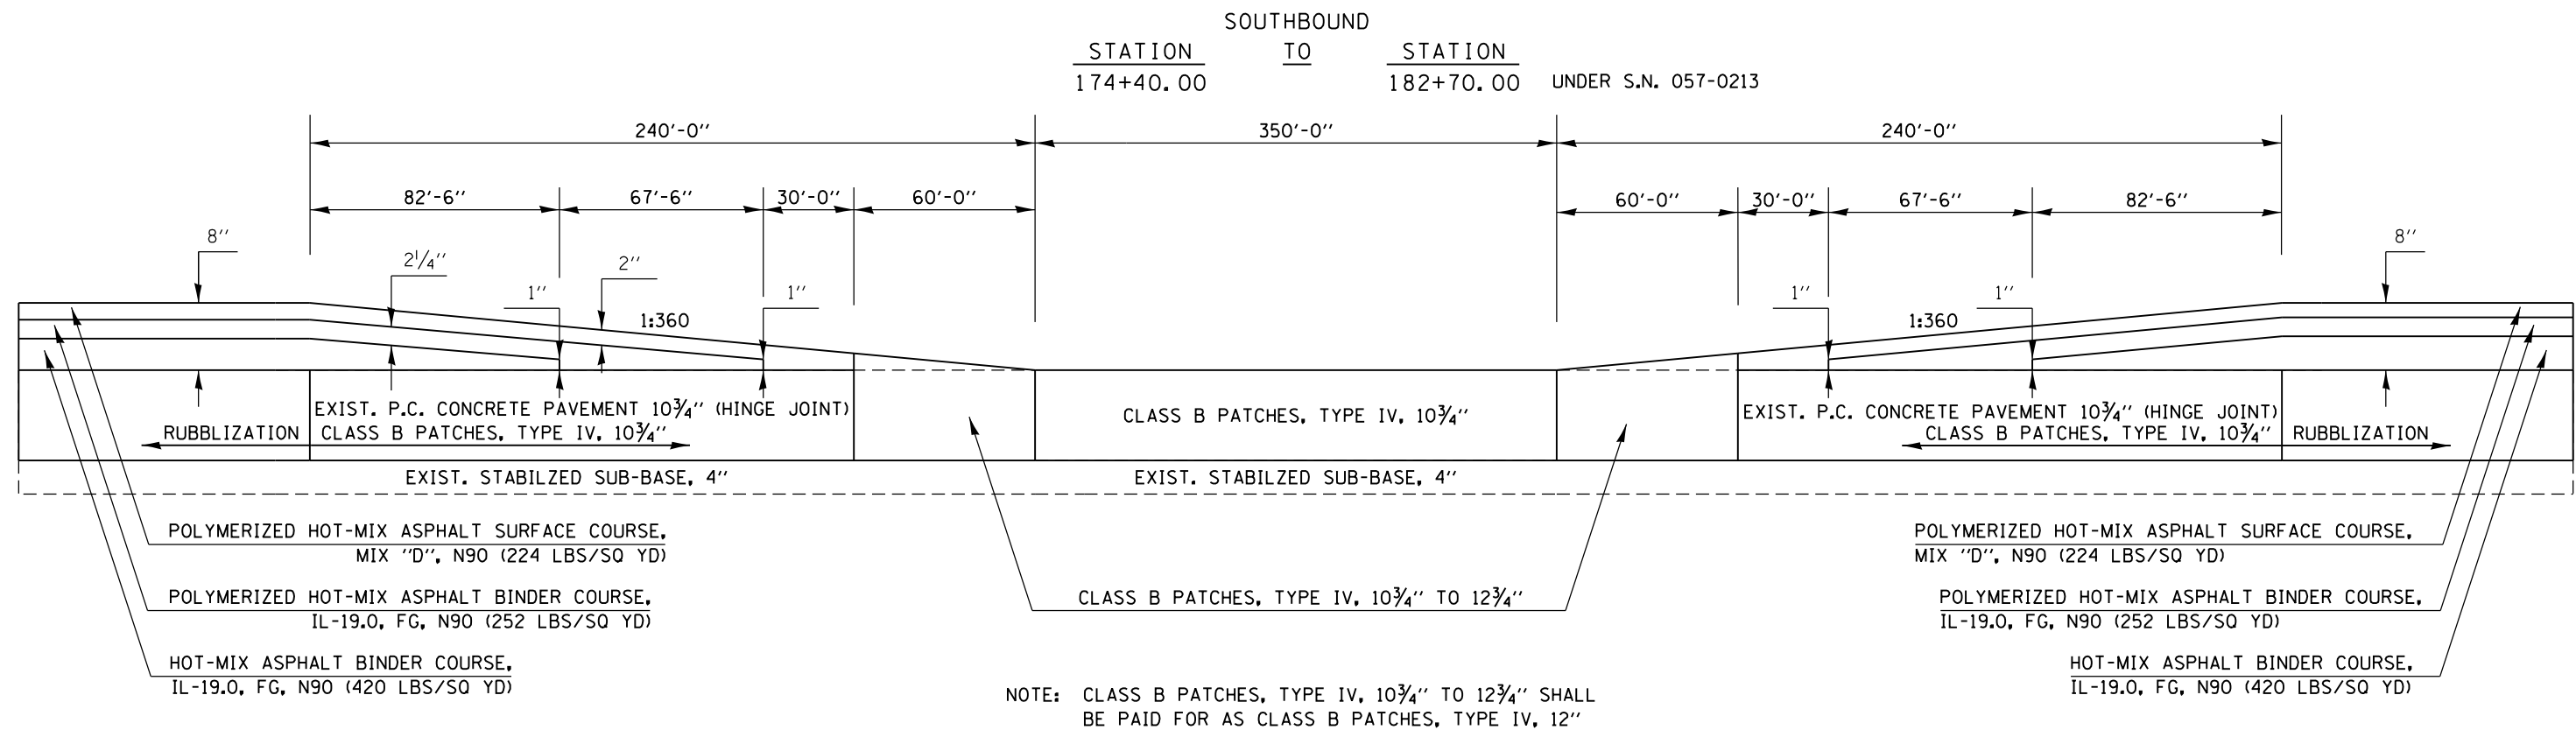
SHOULDER BUTT JOINT AND PAVING TRANSITION
